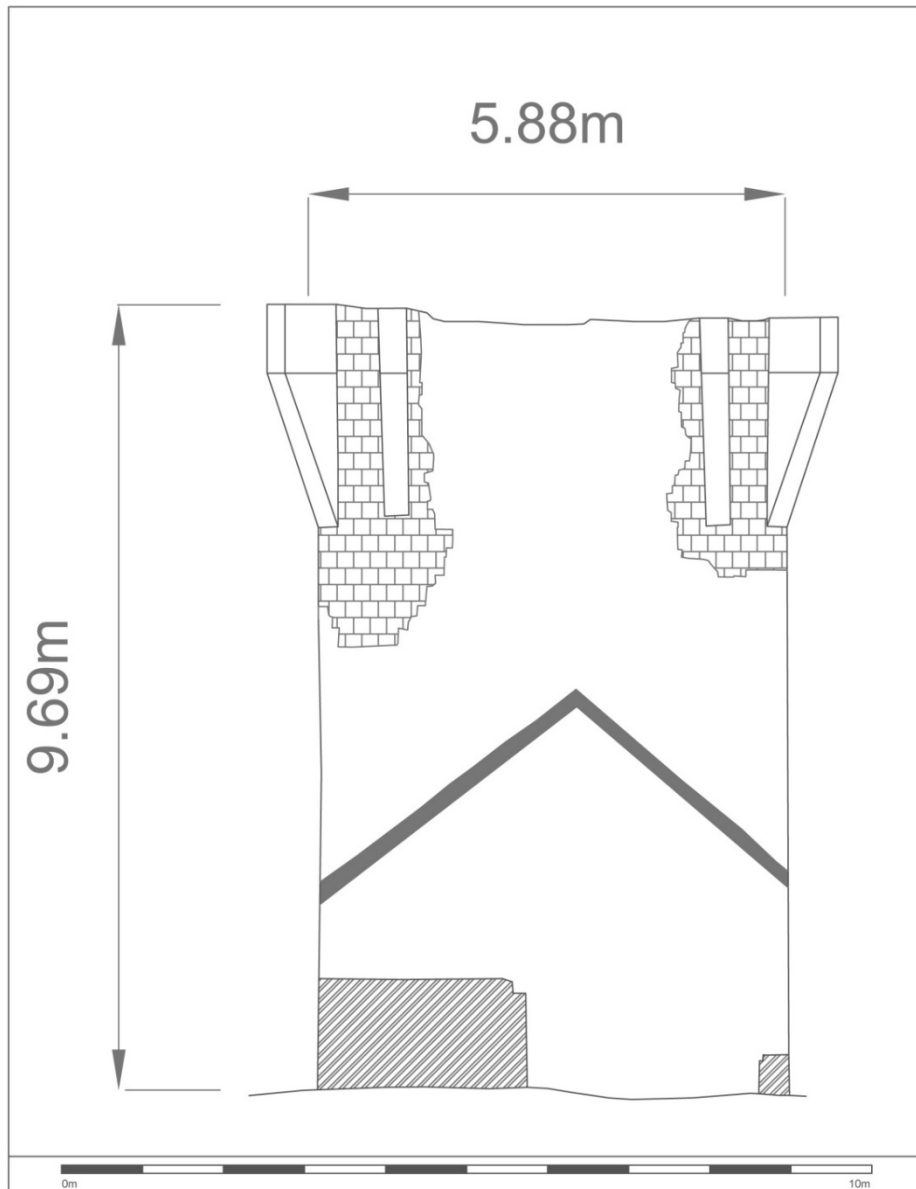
Internal elevation of the north-east wall of the signal tower at Inishmore Signal Station.
